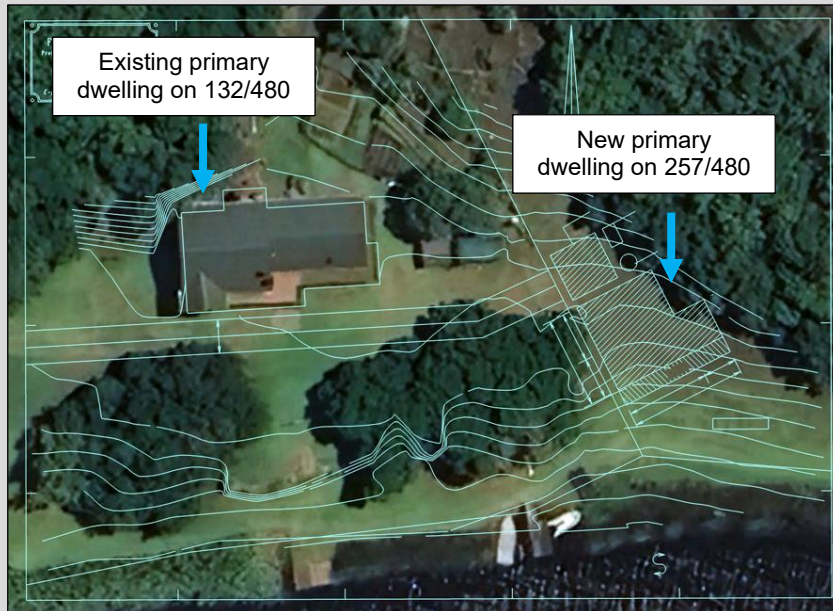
Preferred Site Alternative of the New Primary Dwelling on 257/480 Melkhoute Fontein that is situated in close proximity to their extended family house on the neighbouring property from where existing services and access to the river are already in existence.
